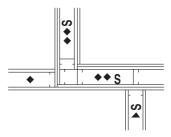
(b) Symbol Used to Note Wall Ratings on Design and Construction Documents.
